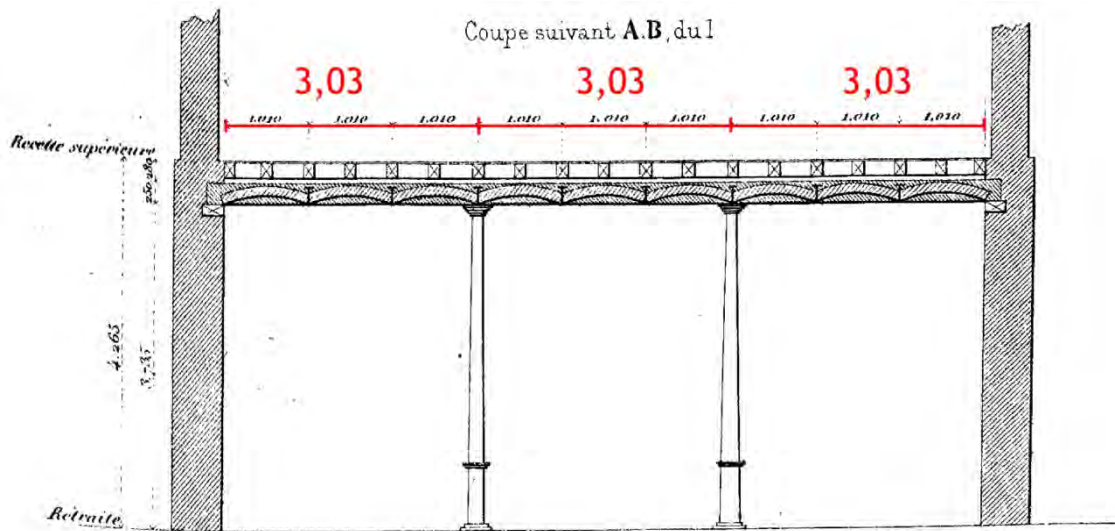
Section A – B through the pillars in the barrack. *Atlas de la Société de l'Industrie Minérale*, 1870 – 1871, planche VIII.
